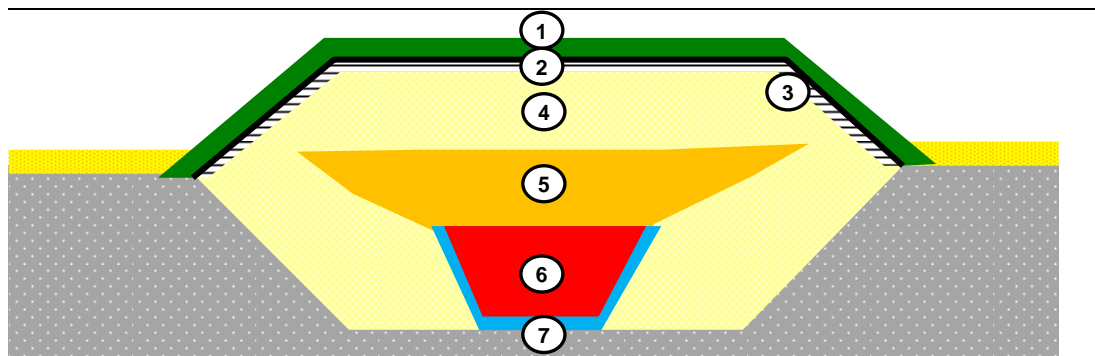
Idealized schematic impression of the build-up of the landfill site
